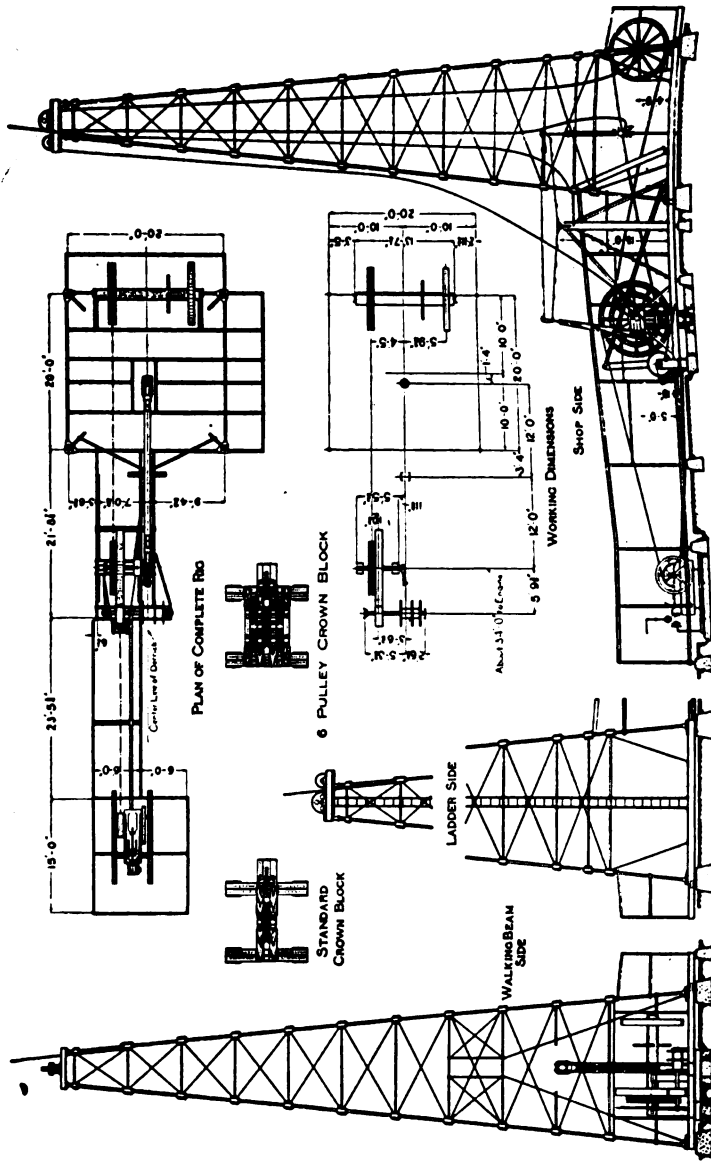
Neill Tubular Derricks. Made from Steel Pipe.
